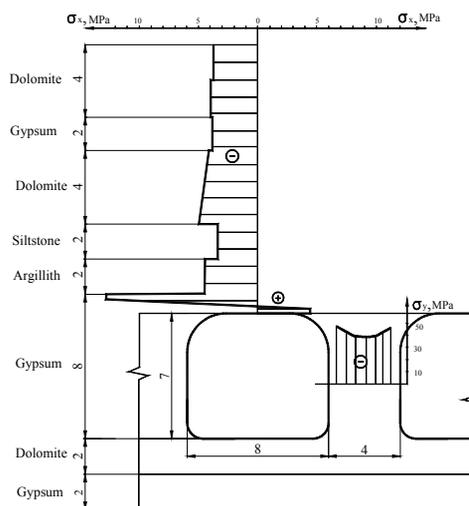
Design diagram and stress eures in roof and pillar rooms.
